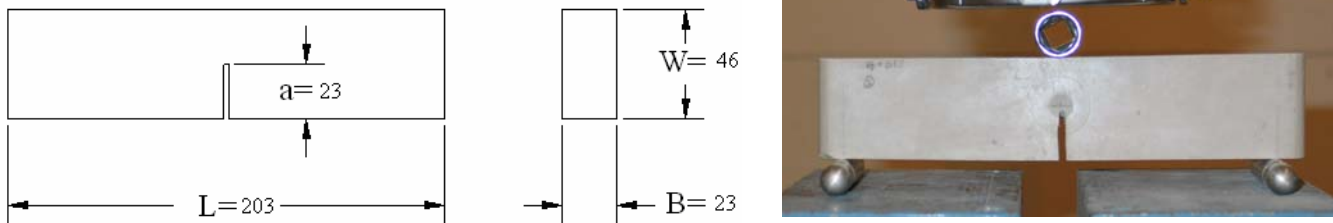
Single edge notch bending (SENB) PVB concrete specimens (mm).
